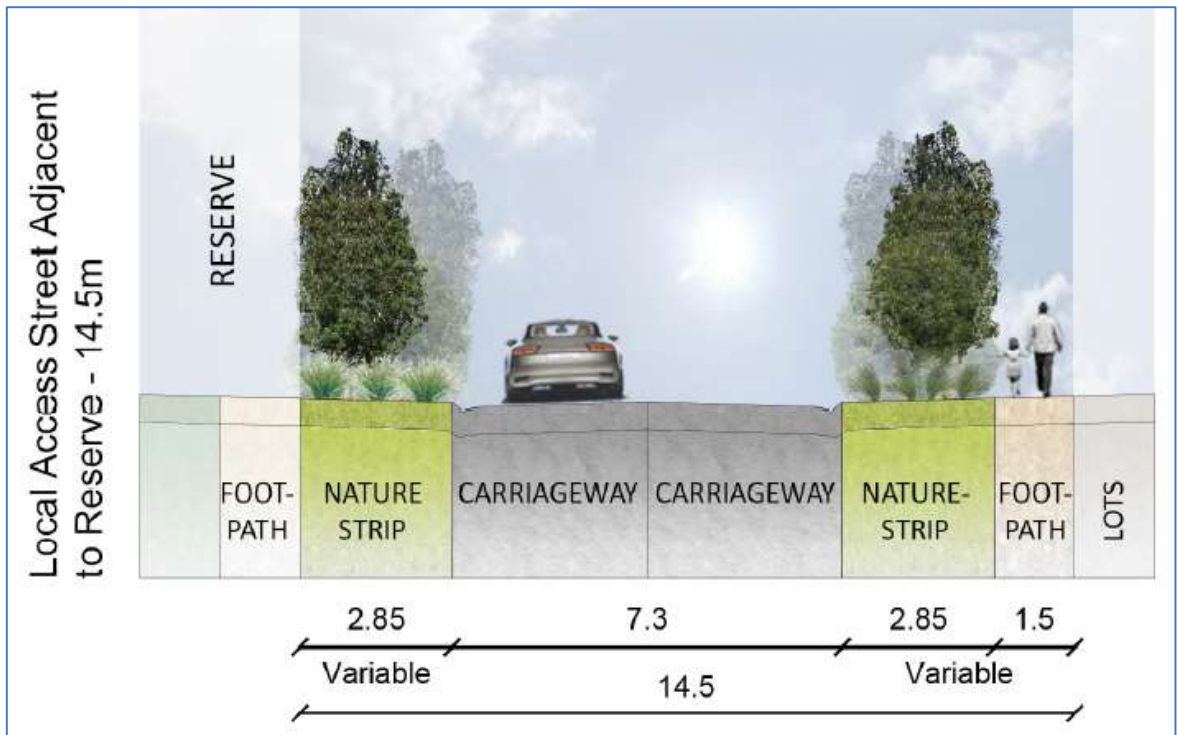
Proposed Access Street Adjacent a Reserve (14.5 metres)
